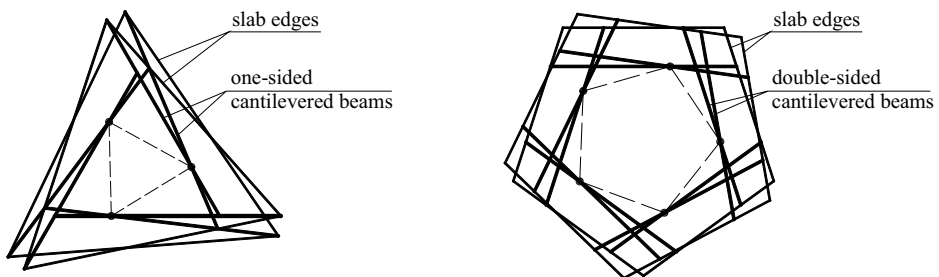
Supporting floor slabs with the use of systems of cantilevered beams.
